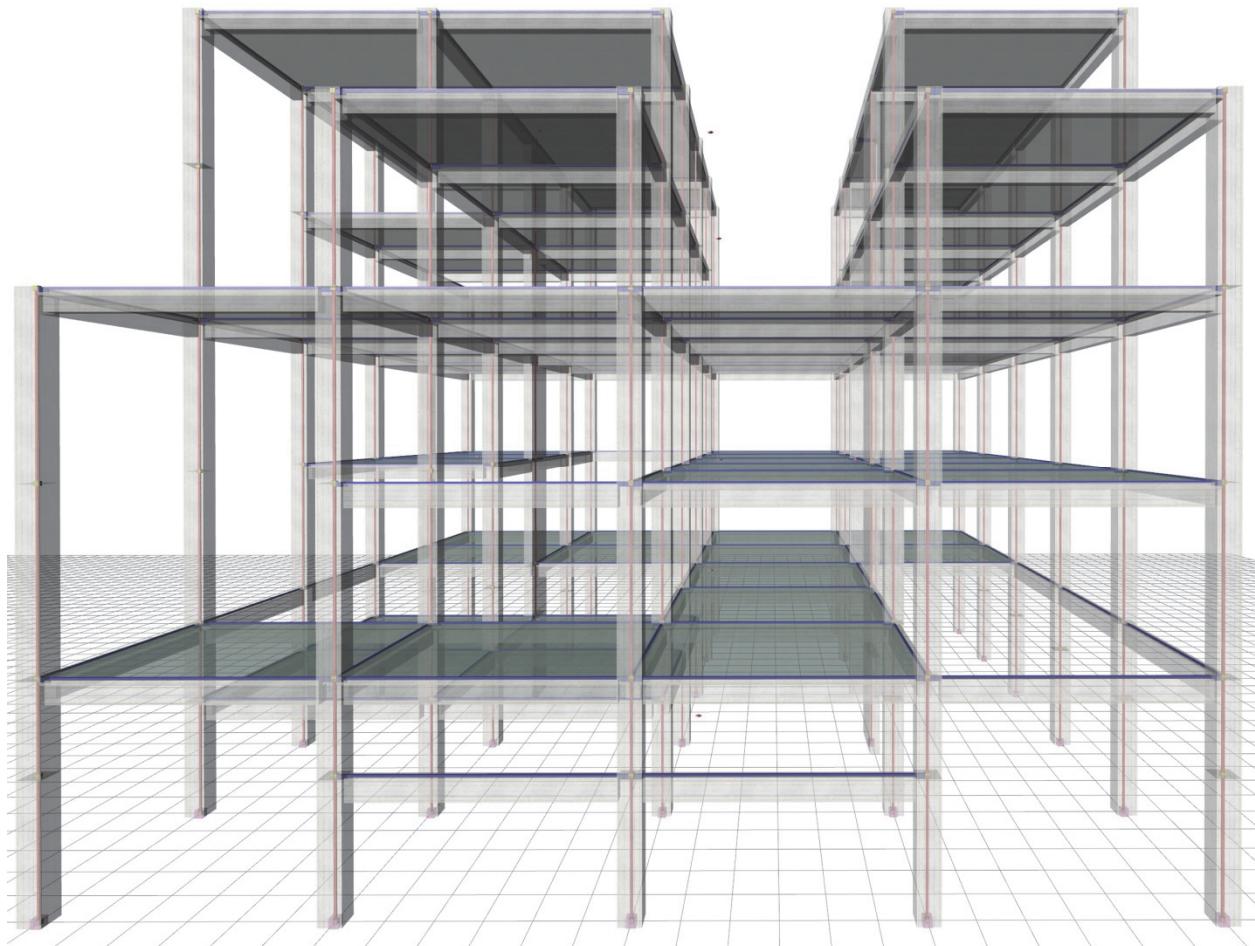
The space frame structural model with bars of columns and beams and diaphragms
